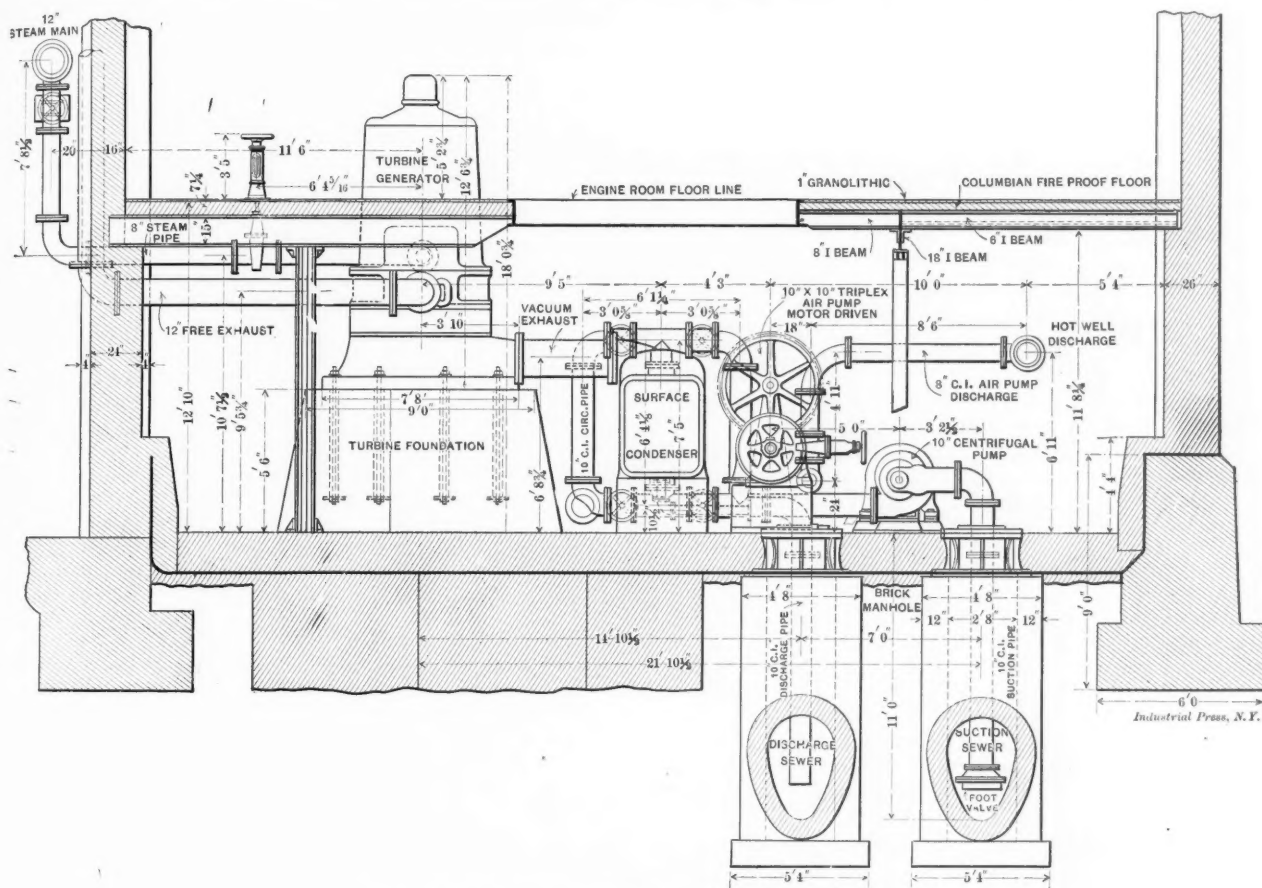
Elevation of Steam Turbine Installation at Newport, R. I.
